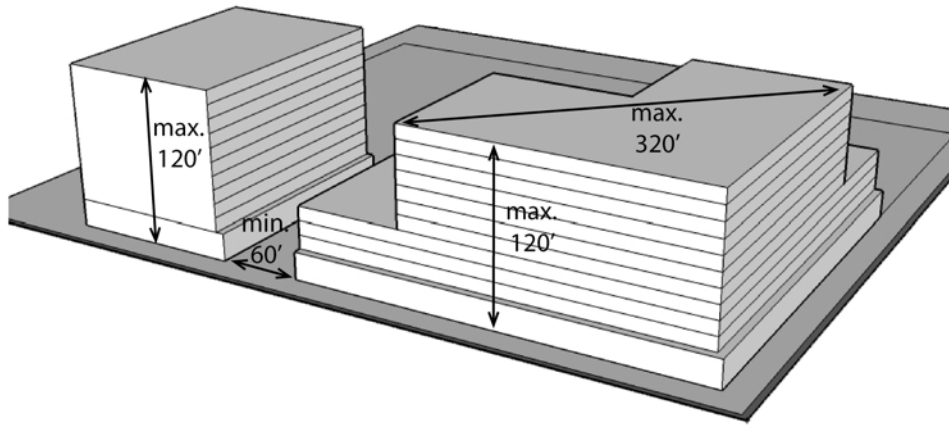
Height, Bulk and Spacing for “L” Shaped Buildings 65’ to 120’ High
